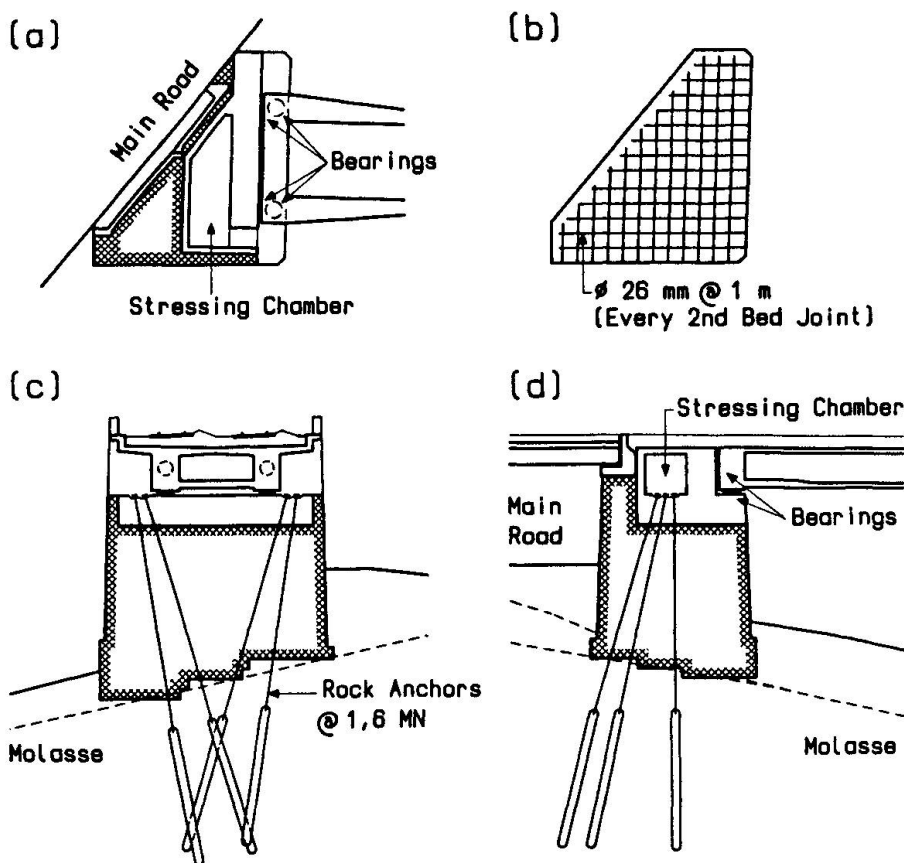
West abutment: (a) Plan view; (b) Orthogonal reinforcement in bed-joints; (c) Cross-section; (d) Elevation.
